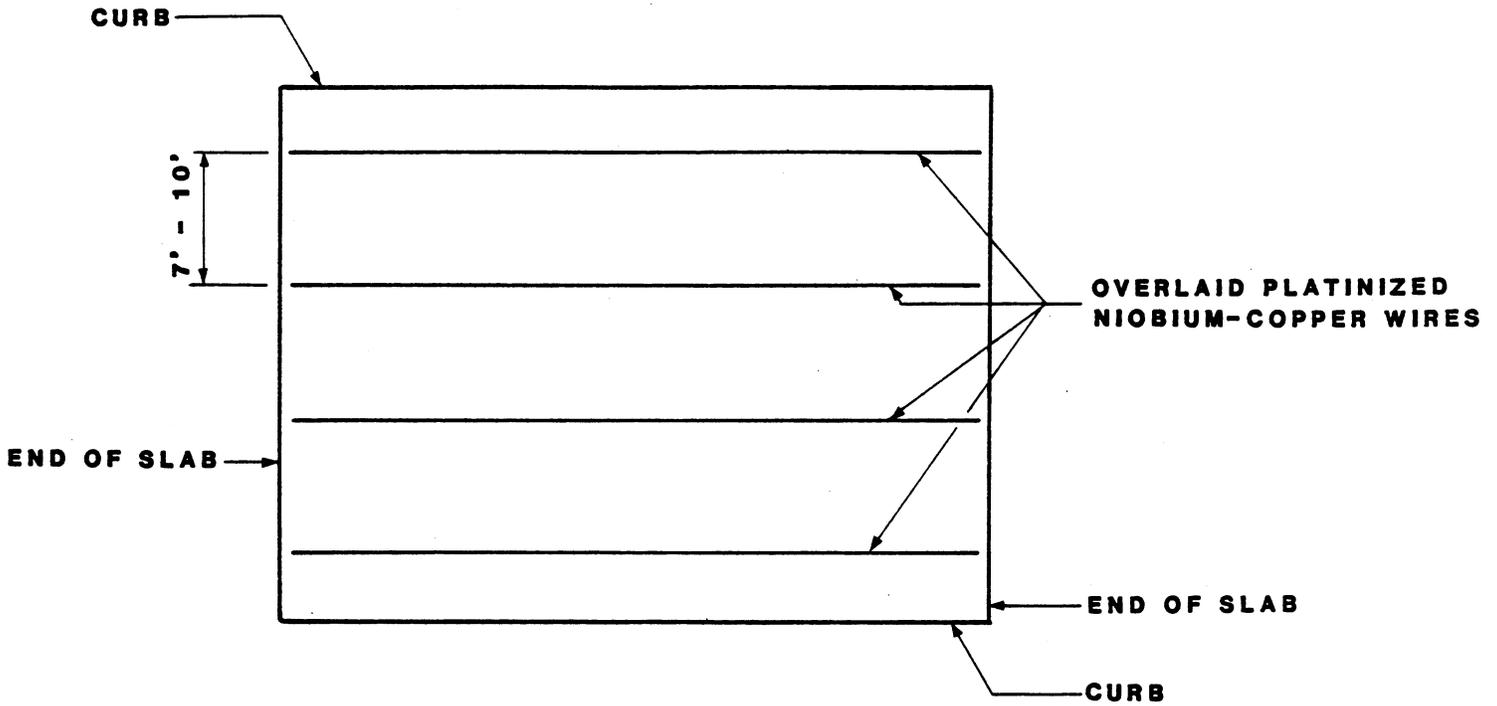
Conceptual plan showing top view of a CP system utilizing conductive portland cement concrete as an overlay and secondary anode.
